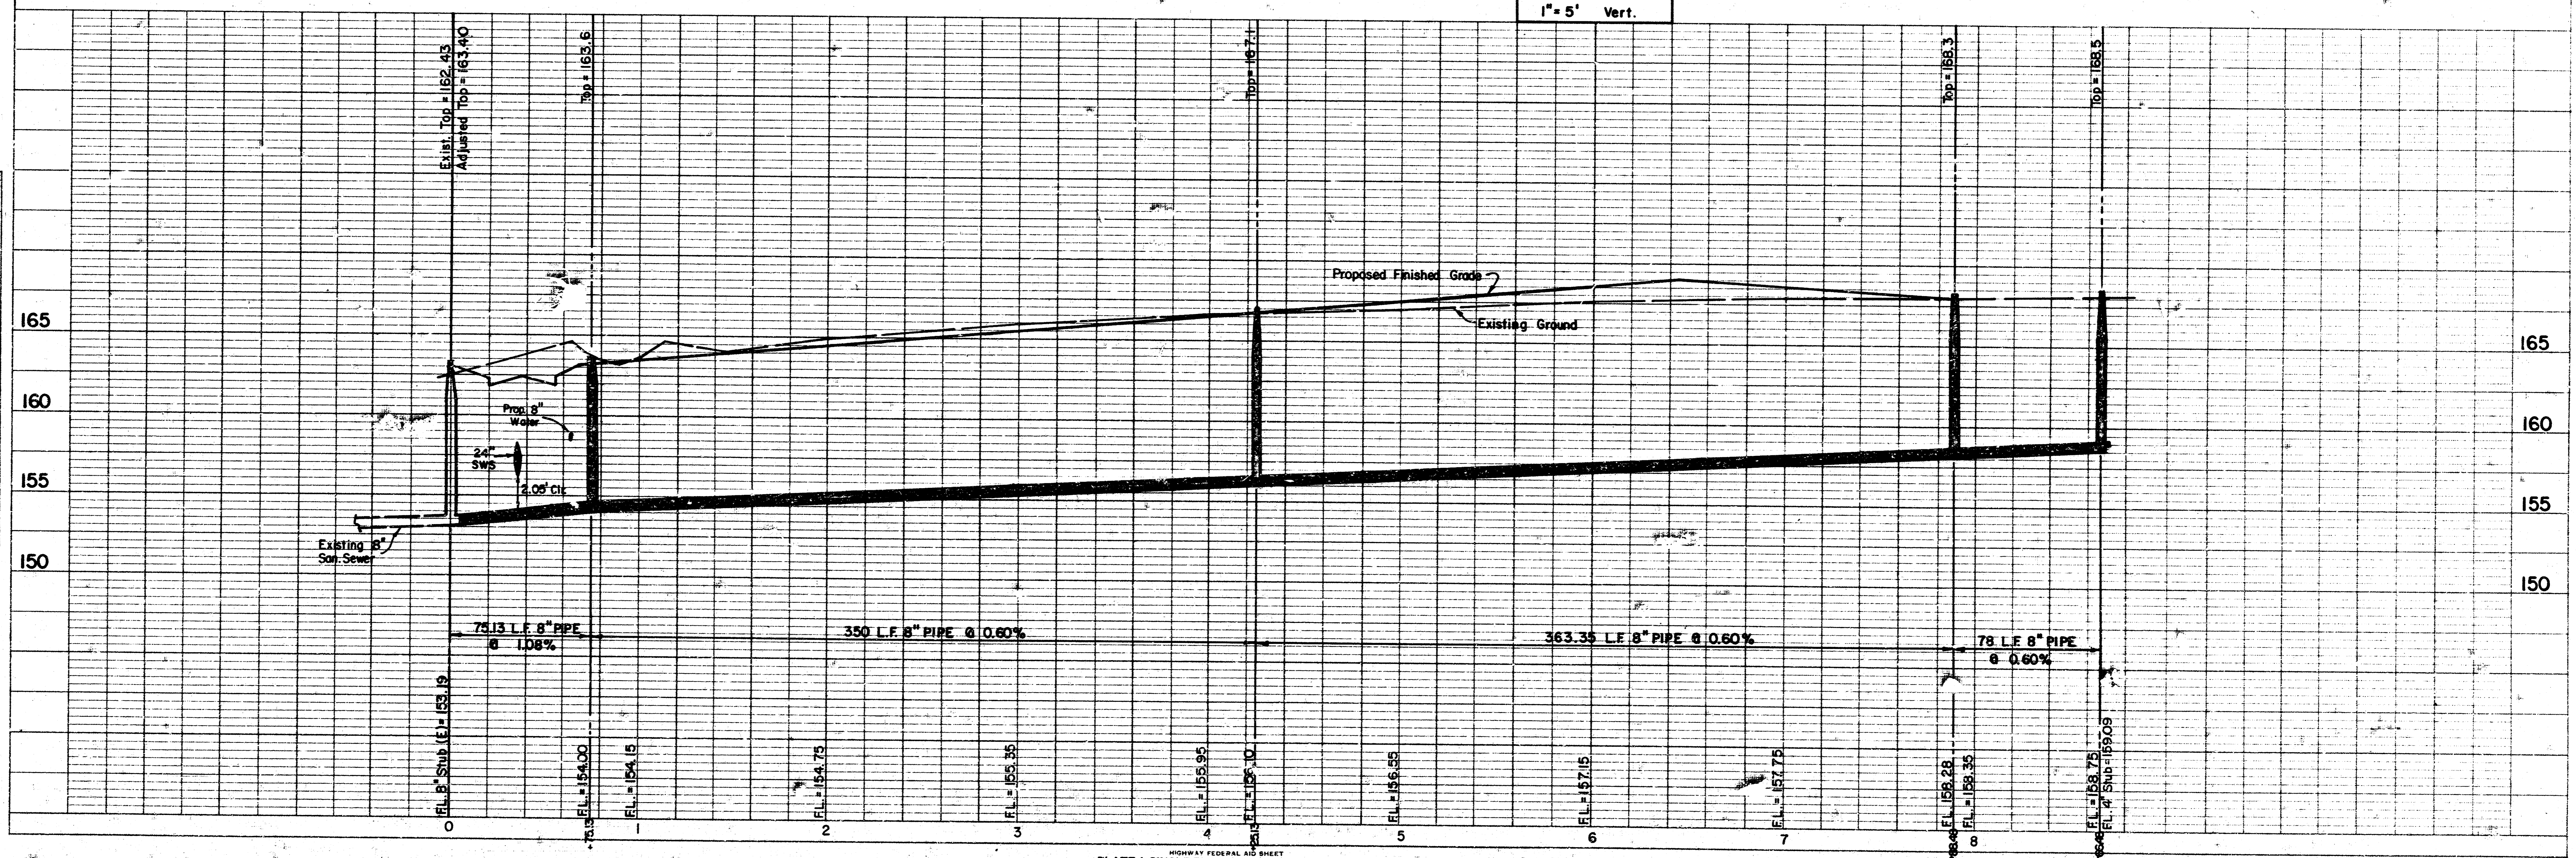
SINGLE PLAN AND PROFILE-FULL LINE
